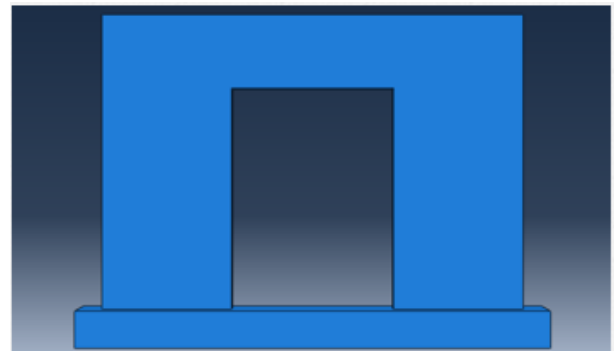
Model 1 Shear wall with size of opening 3 m x 2 m
